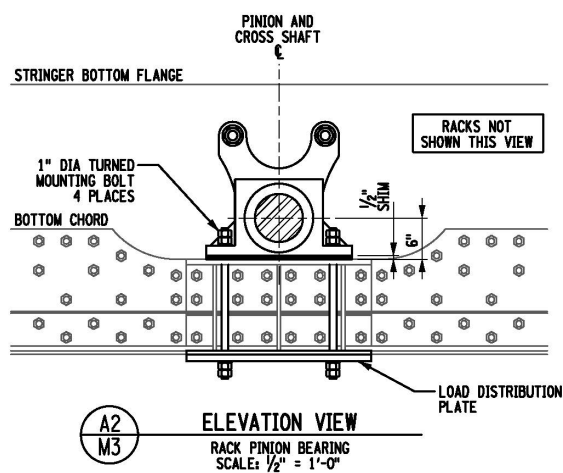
Rack Pinion Frame Carrier Assembly. Elevation View at Bottom Chord.
